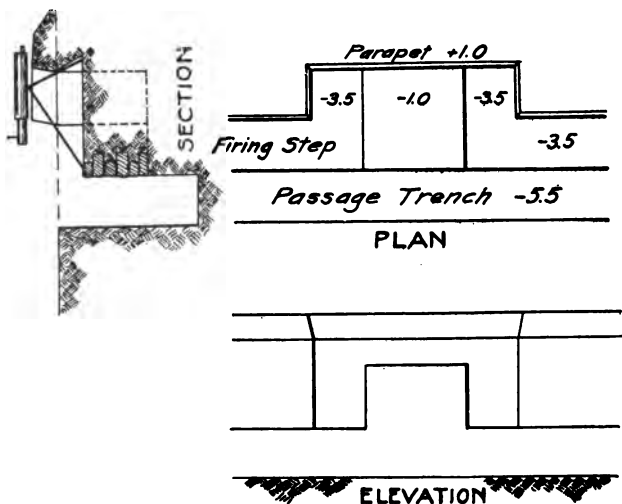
PLAN OF MACHINE GUN EMPLACEMENT
